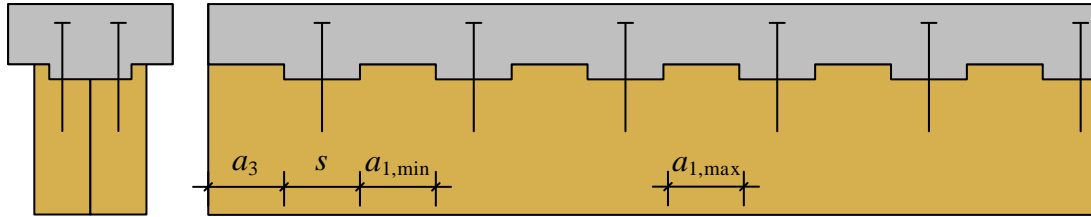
Illustration of the arrangement of notches as connecting elements.
